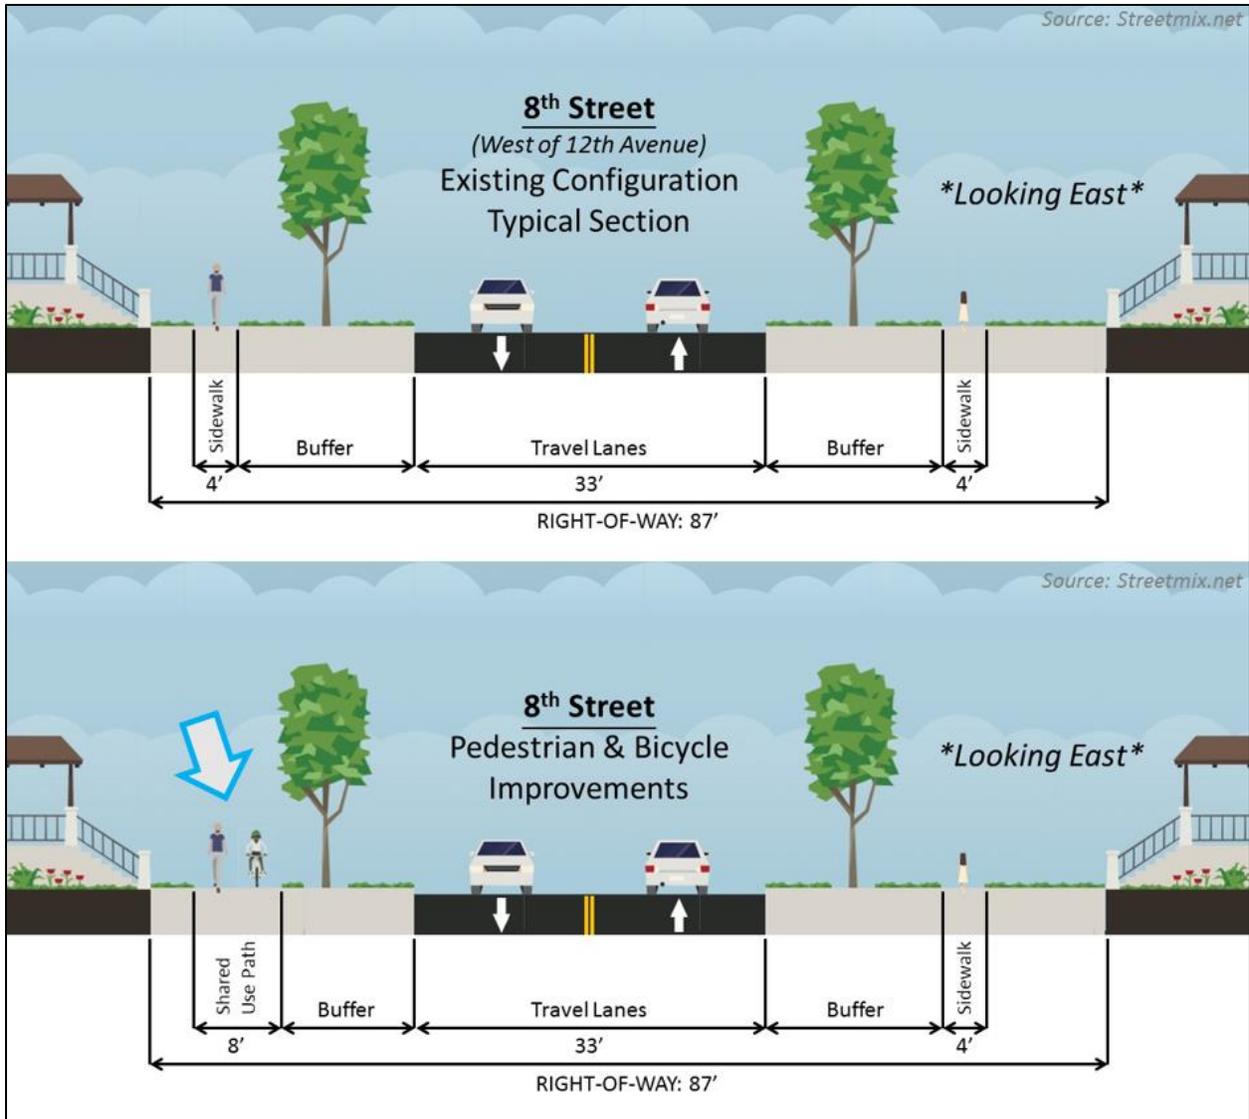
Optional Add-On – Proposed Shared Use Path Typical Section along 8th Street
